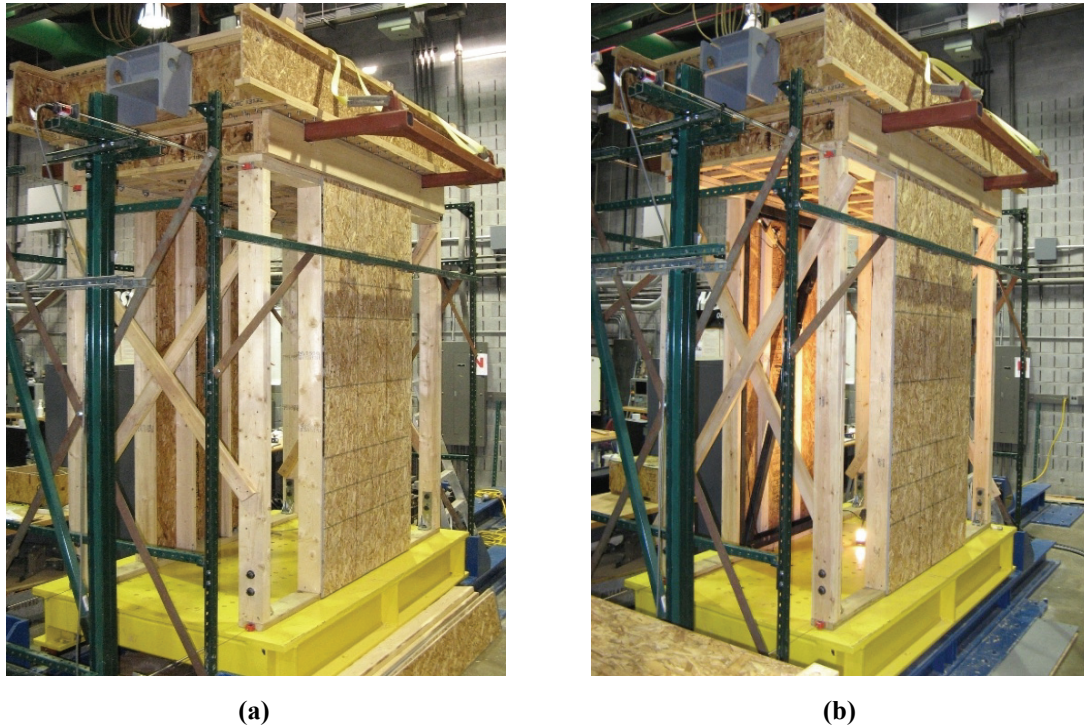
Test Specimens on Seismic Shaking Table: (a) Conventional Walls and (b) Retrofitted Walls (note black steel toggle-braced framing inside of left shearwall)
